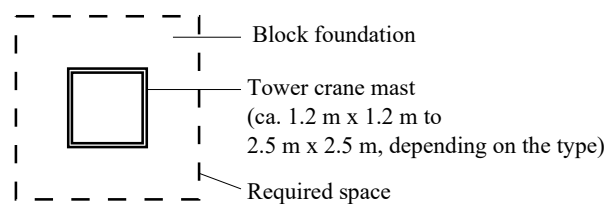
Top view of a tower crane mast with dimensions (Schach & Otto 2017, p. 28).
